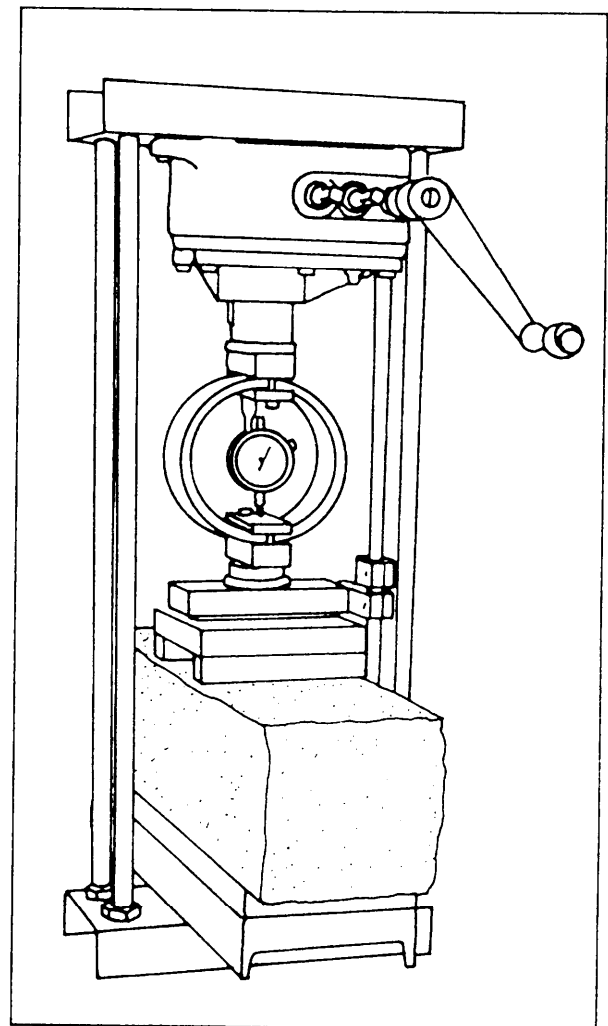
Alternate testing assembly using CBR test equipment.
